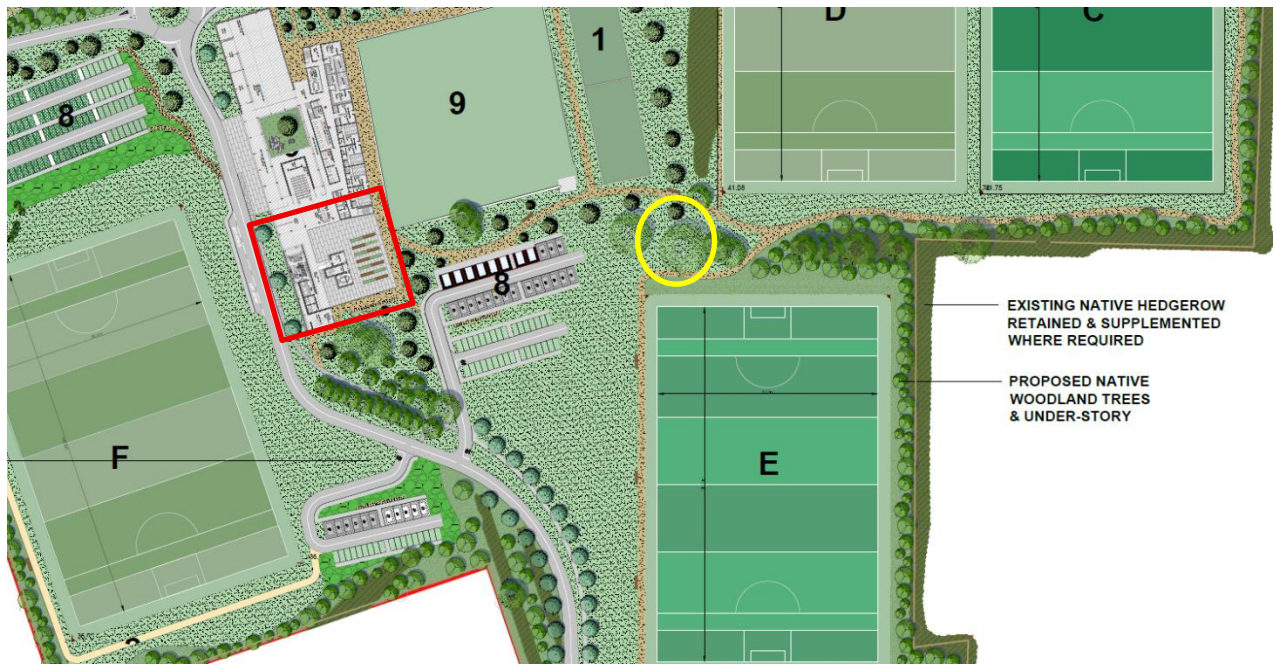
Location of retained roost in residential building (red outline) and tree (yellow outline)
